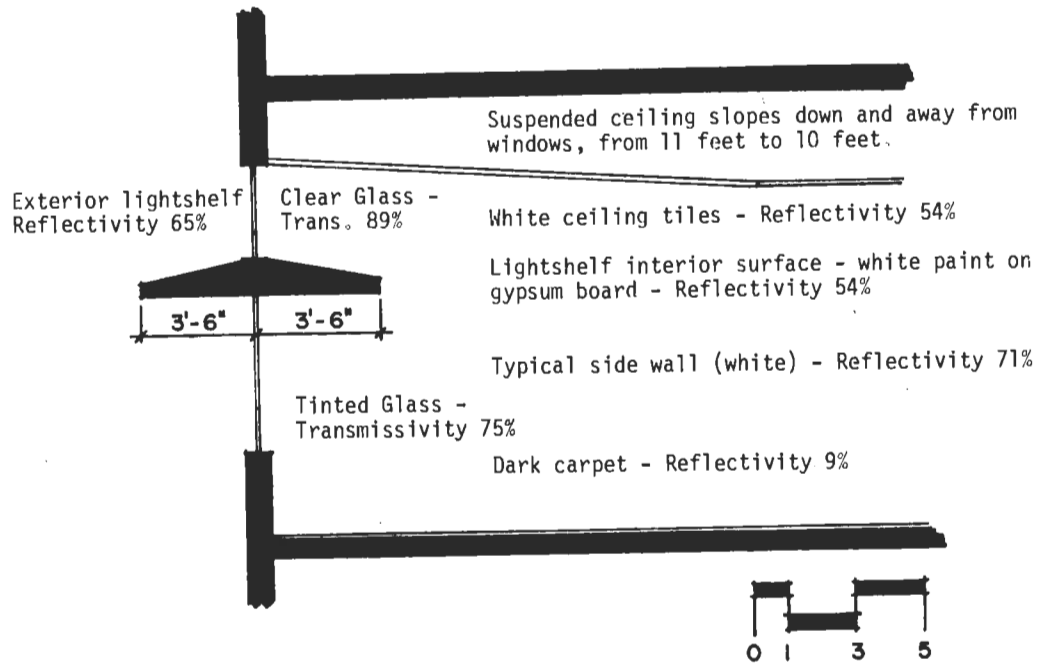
ROOM SECTION @ LOCKHEED / AUSTIN
